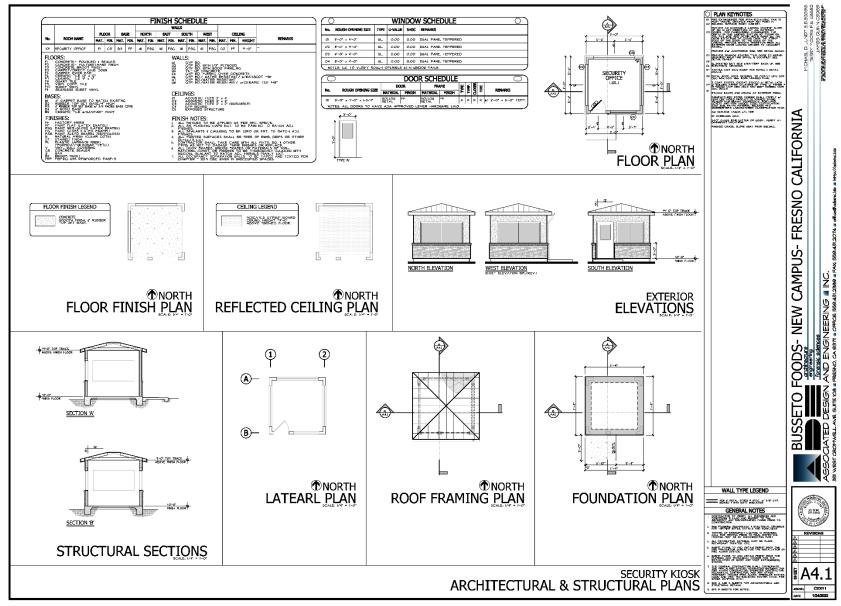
Architectural and Structural Plans of proposed Security Kiosk
